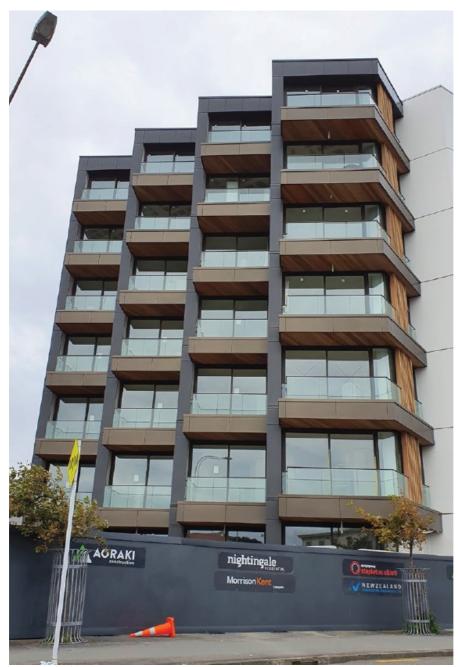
Staggered balconies maximise privacy while retaining outlook and sunlight access (Wellington)
